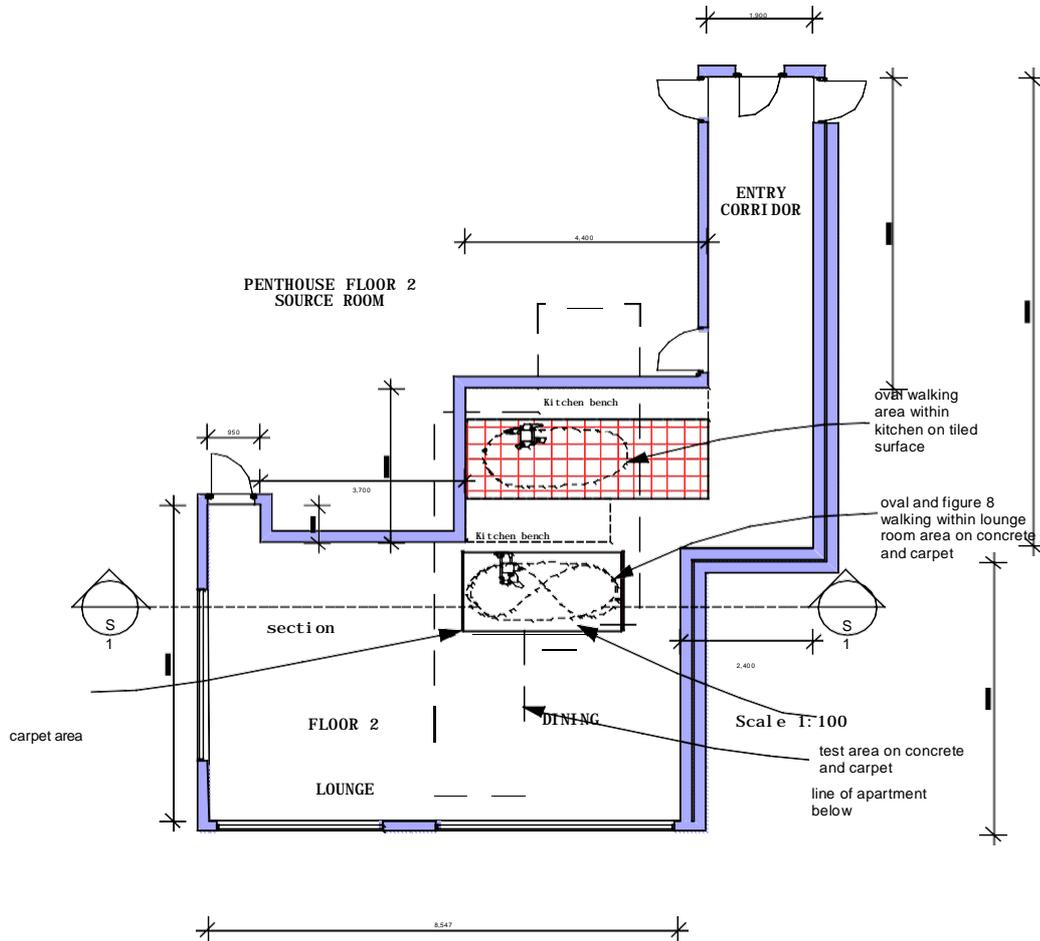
FLOOR PLAN OF PENTHOUSE FLOOR 2
